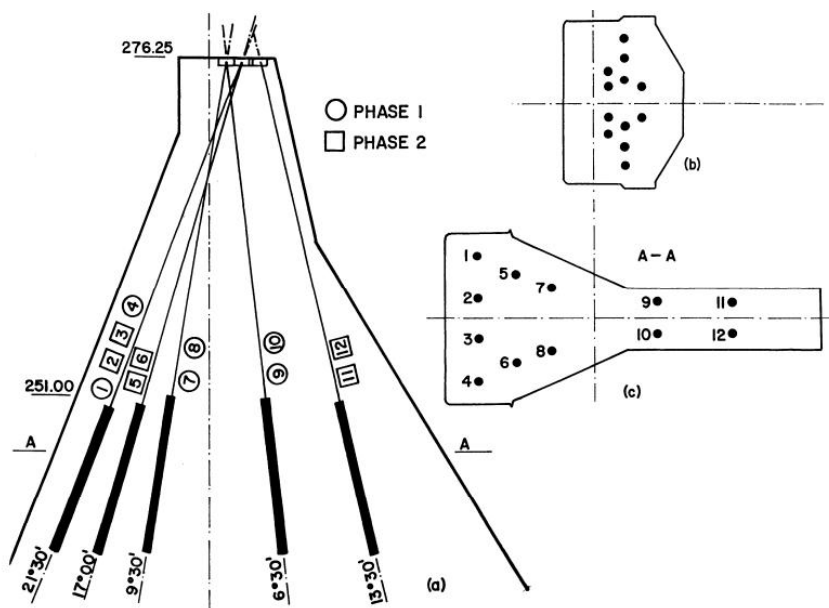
Arrangement of post-tensioned anchors in damaged buttresses: (a) cross-section of buttress, (b) top elevation, (c) Section A-A [1]
